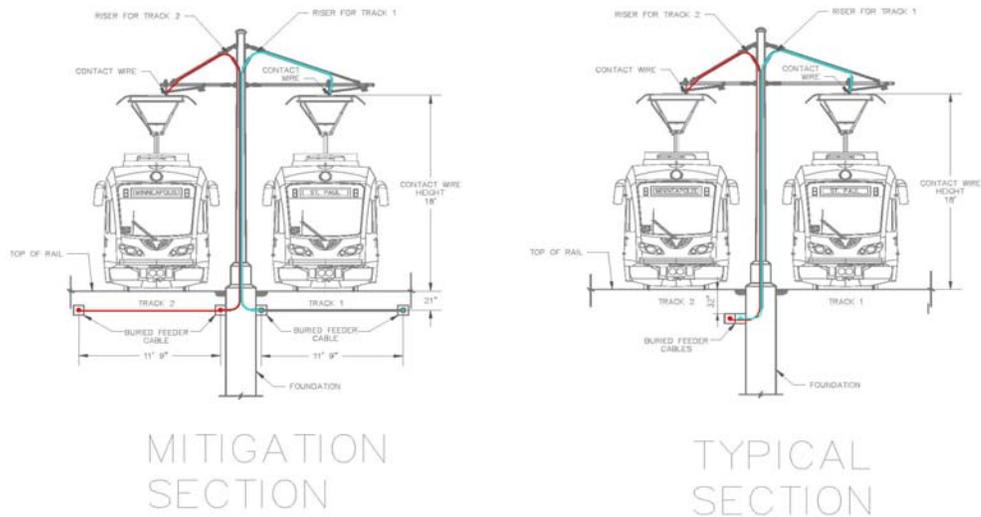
Layout of Power Supply Wires in the Mitigation Section
